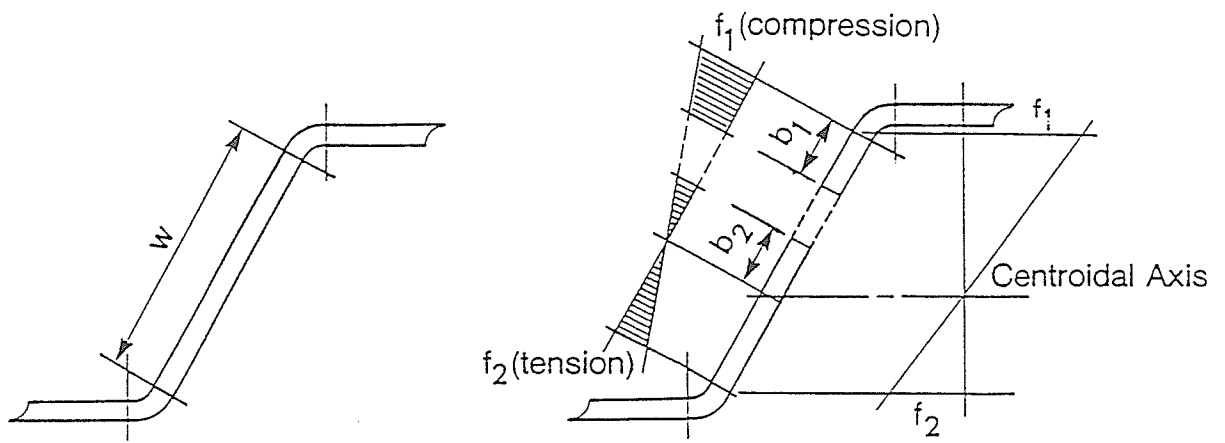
Example of Stiffened Web Element Subjected to Stress Gradient (Compression and Tension)
